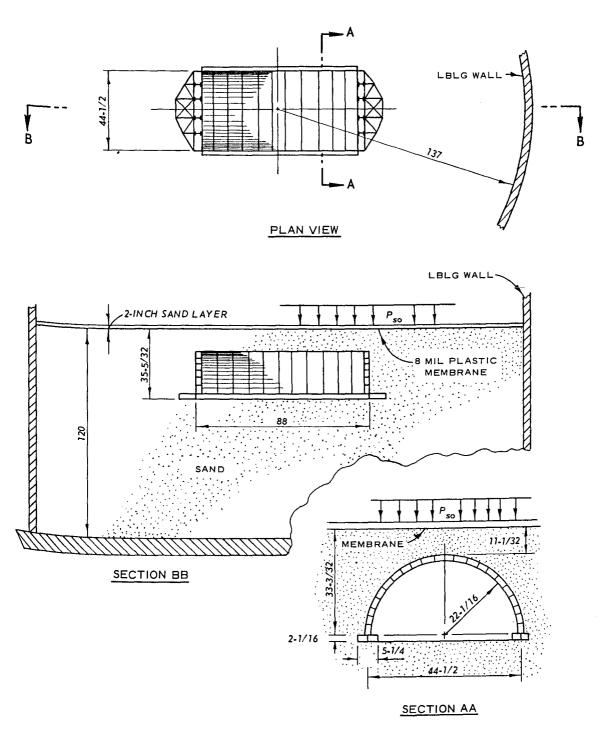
Test geometry and location in the LBLG. Dimensions are in inches.
